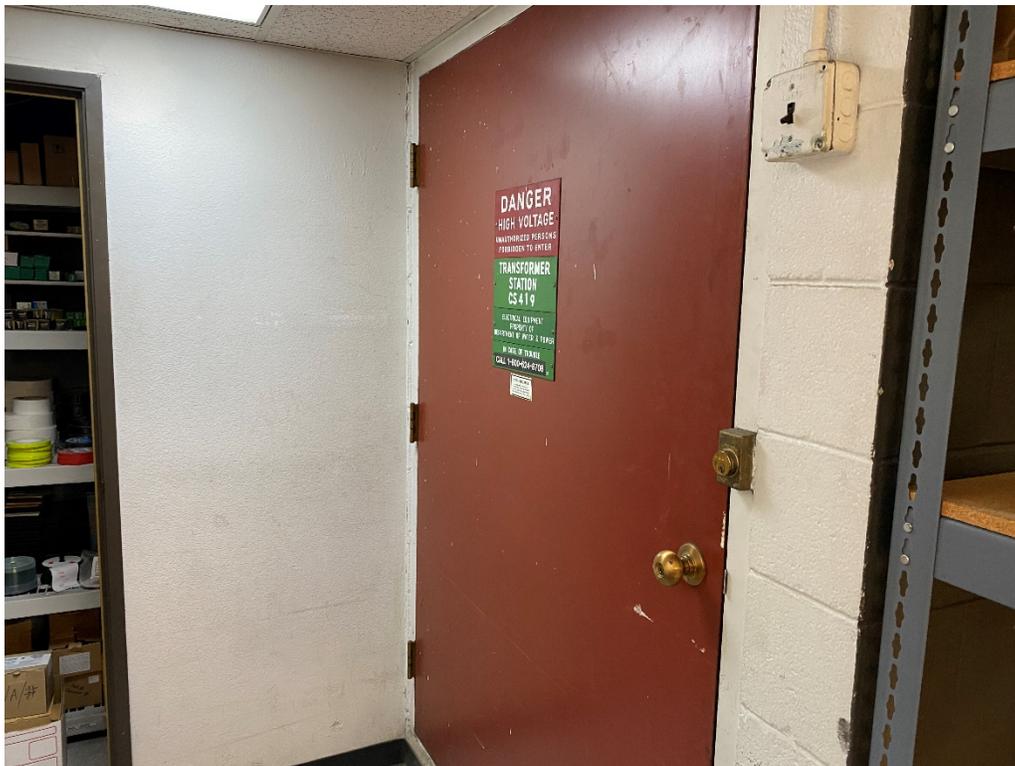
Dark Room* located in the northwest corner of the ground floor (06/01/2021).
